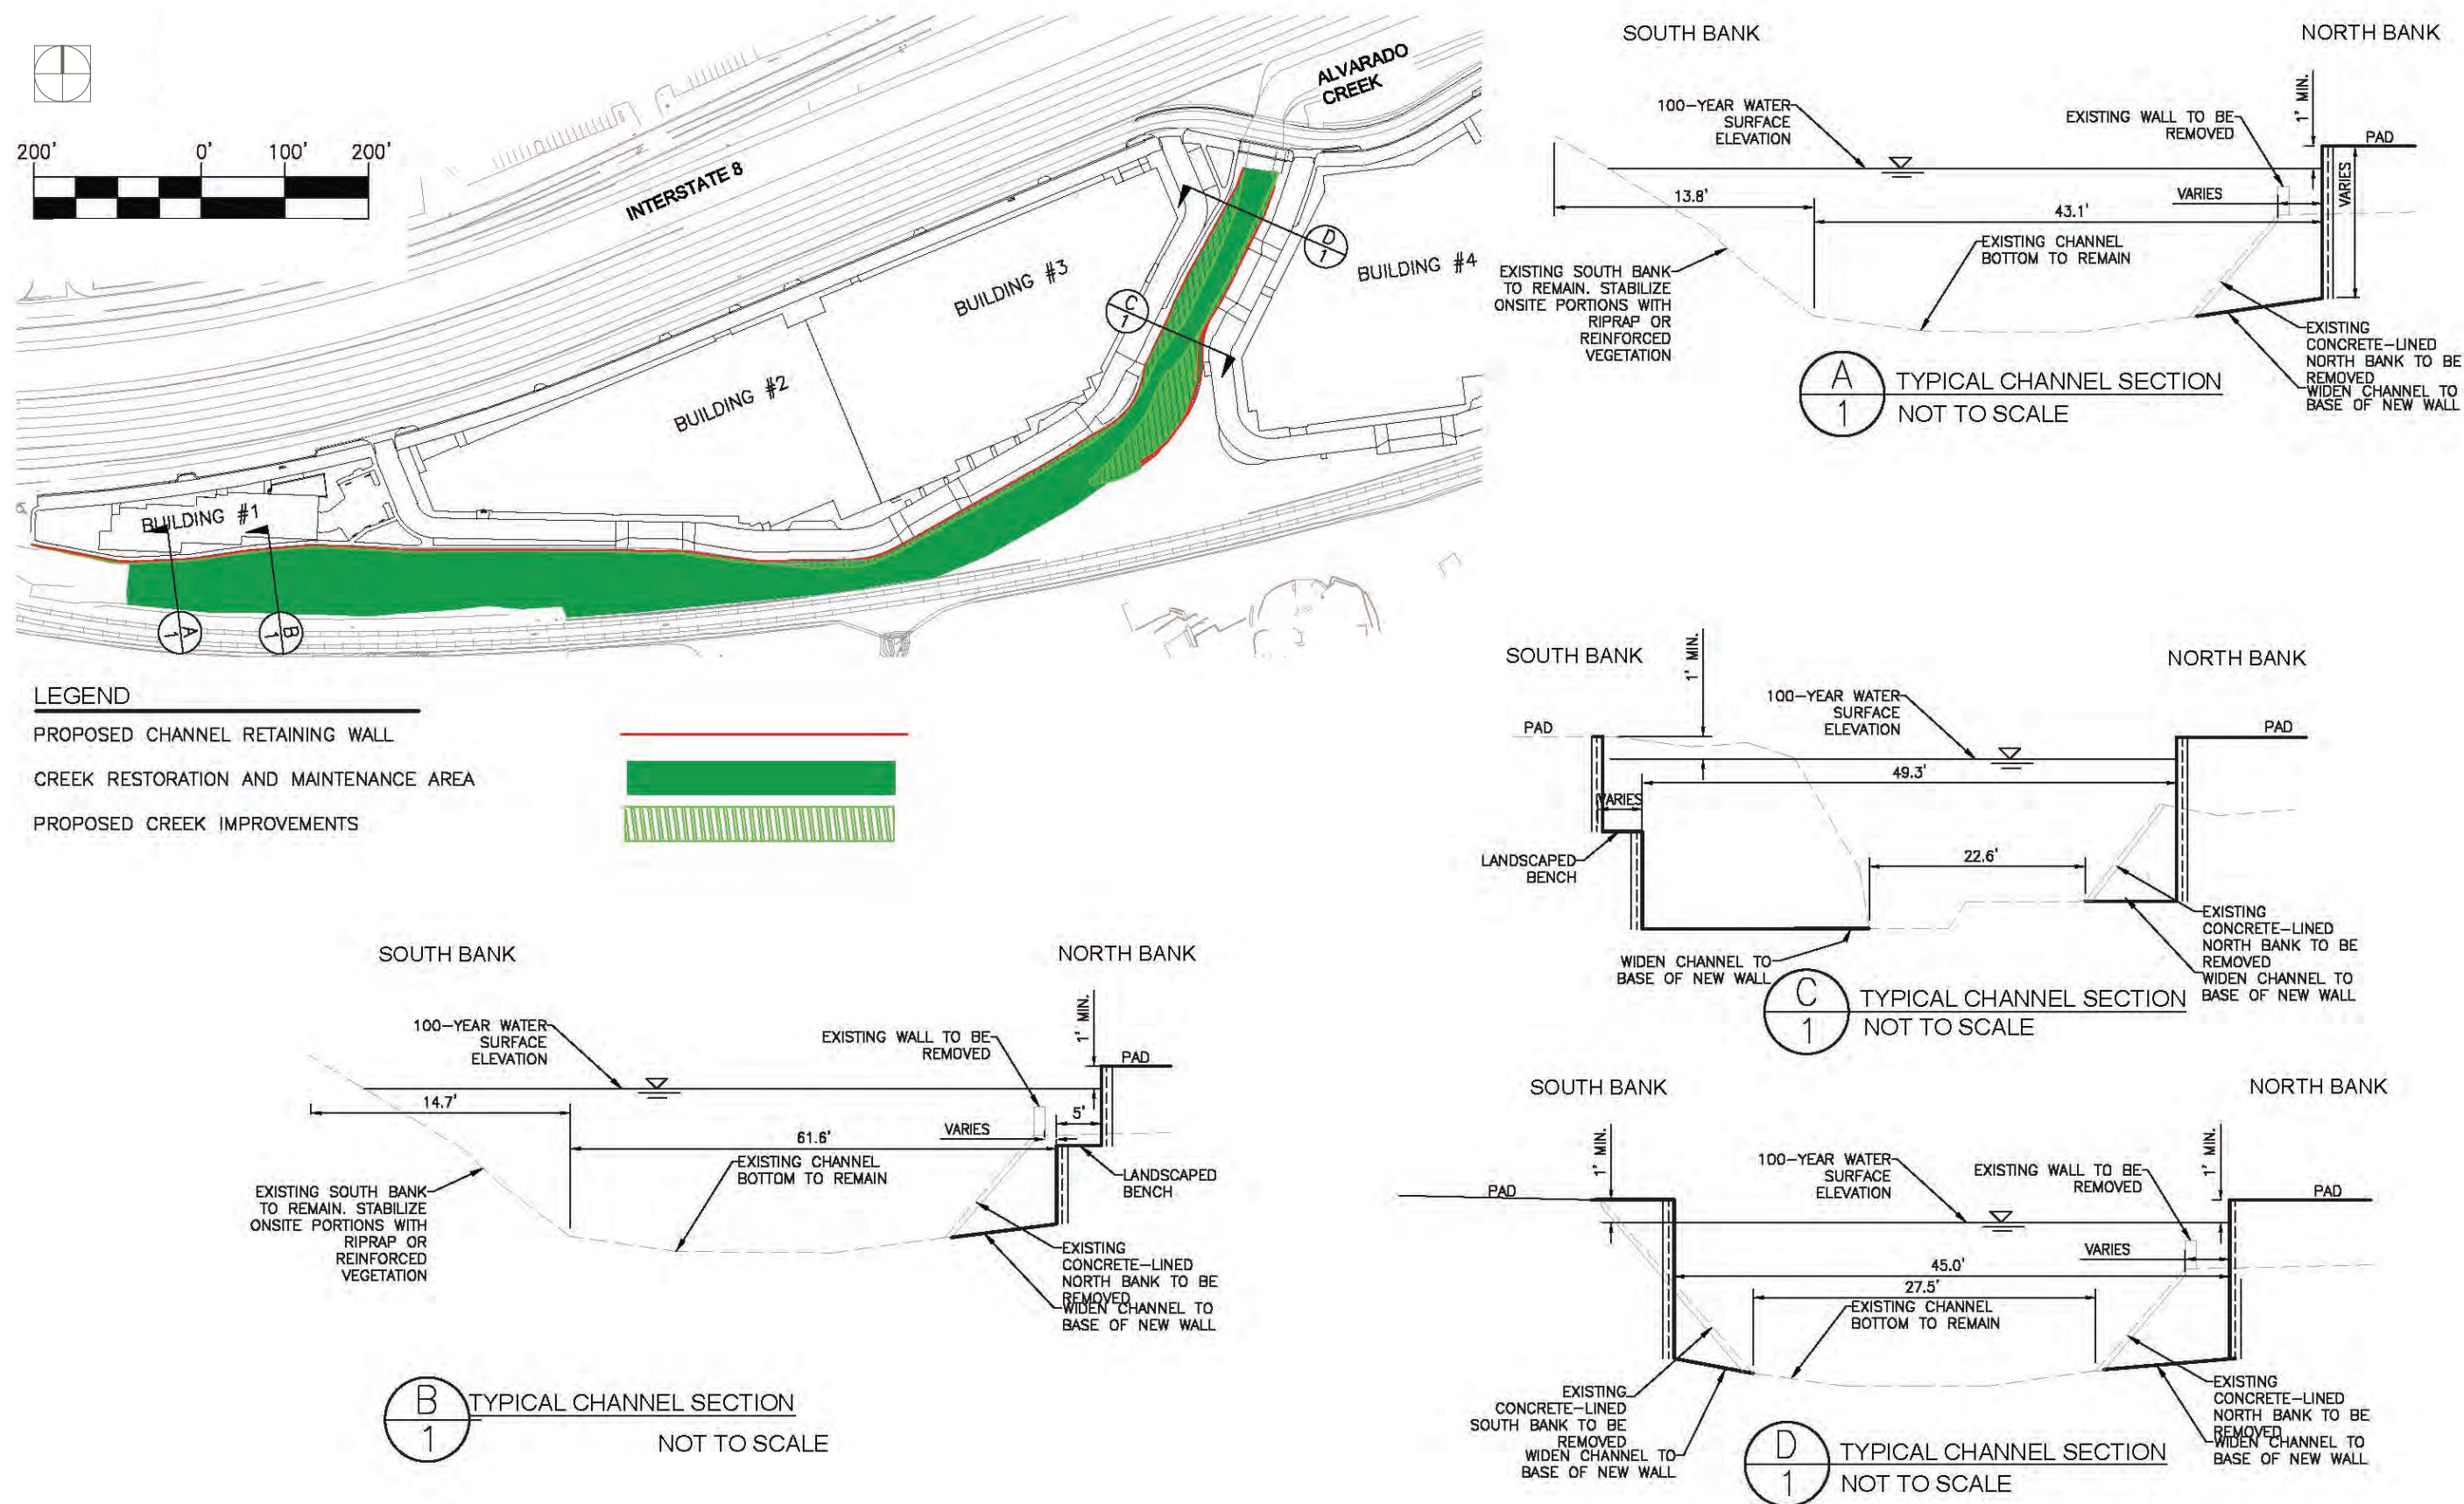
Site Plan View with Flood Channel Improvement Locations
